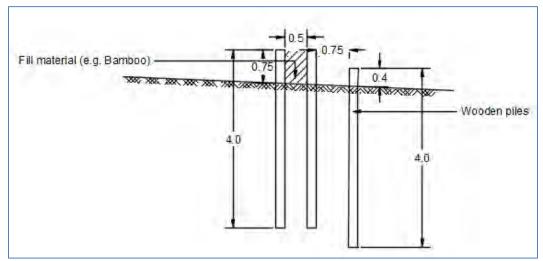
Typical Detail of Sediment Trapping Unit.
